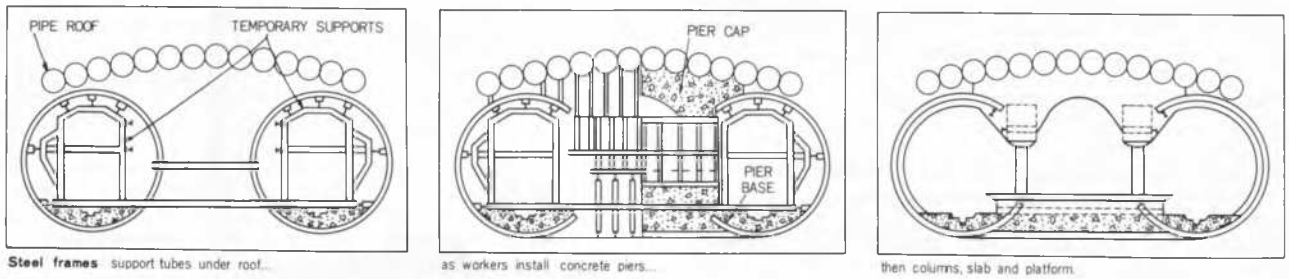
"Steel Pipe Roof" method to construct a subway station (courtesy of Hazama Construction Co.)
